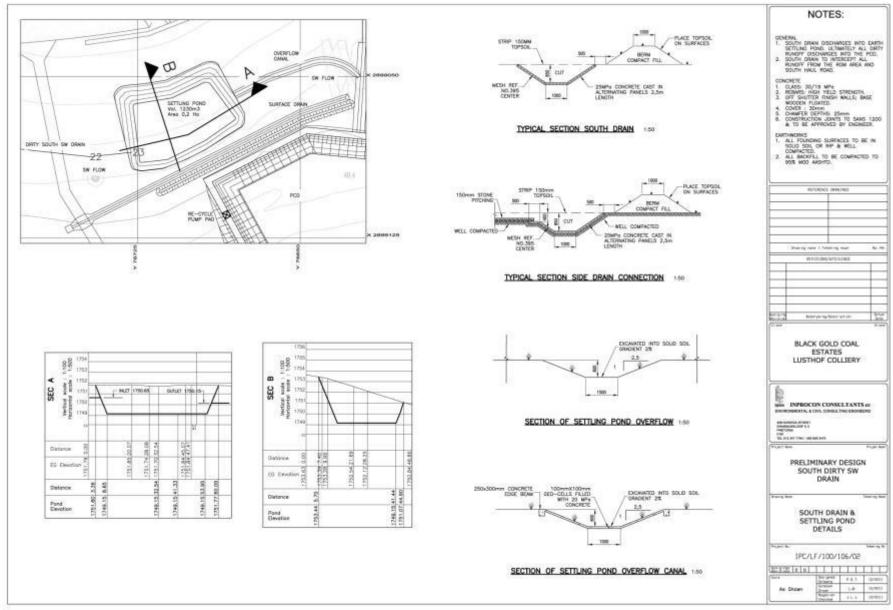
(b): South Dirty Surface Water Drain and Settling Pond - Drain and Settling Pond Details.
